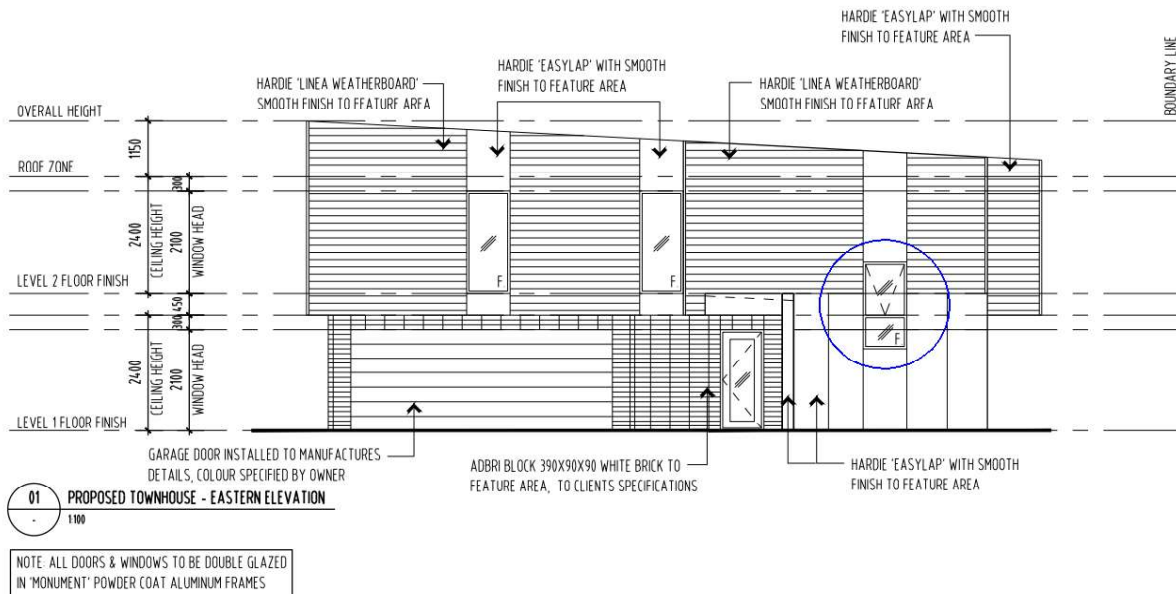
Townhouse Eastern Elevation - Window shown in blue circle
